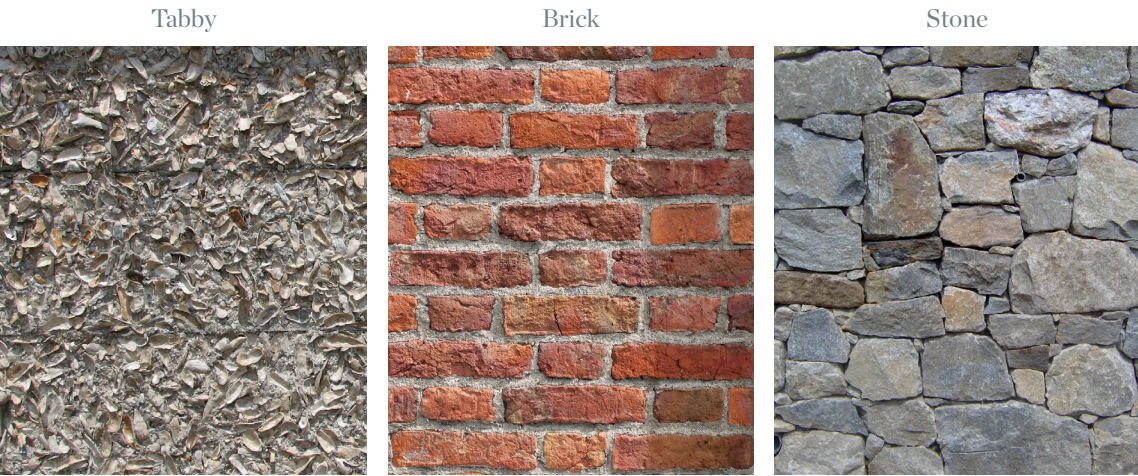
RETAINING WALL MATERIALS
